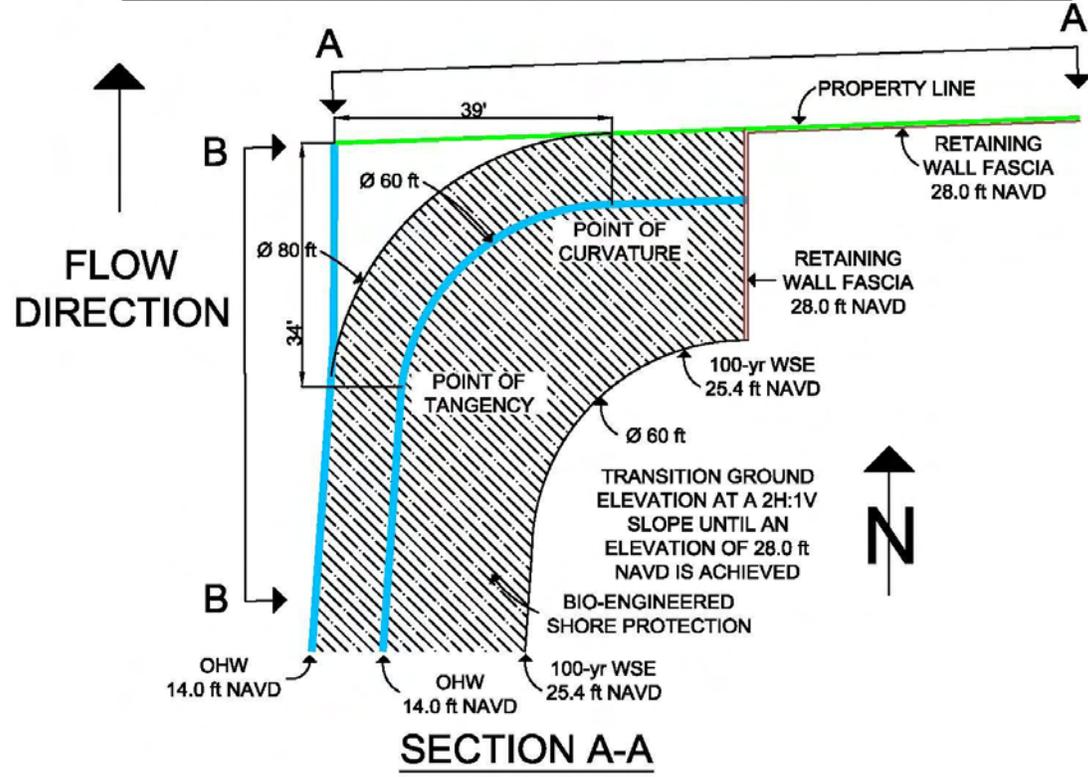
Bioengineered Shore-Protection Structure Detail with MSE Retaining Wall on Property Line – Northwest Corner
